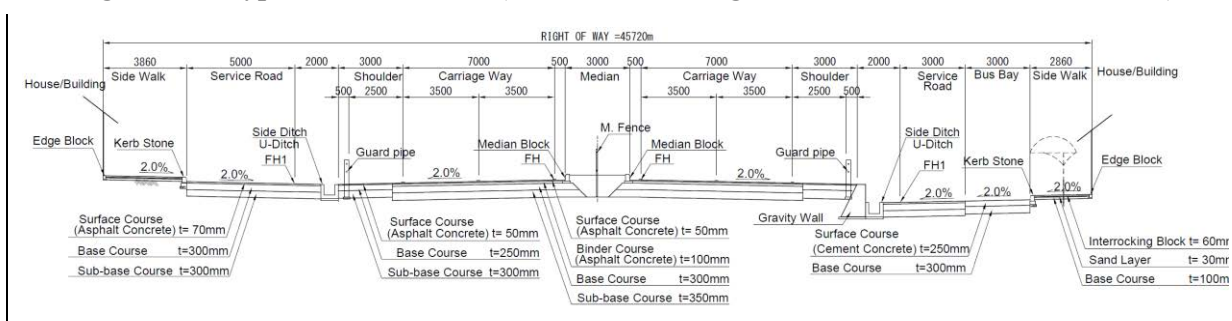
Typical Cross Section (Banepa Bazar)
